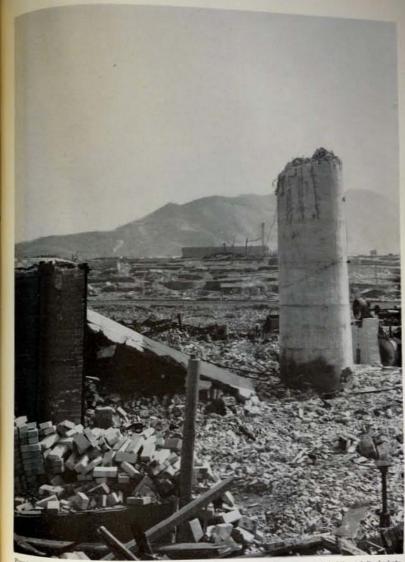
1,400 feet from GZ. Group 12. View looking southwest at concrete building near south end of group area.
